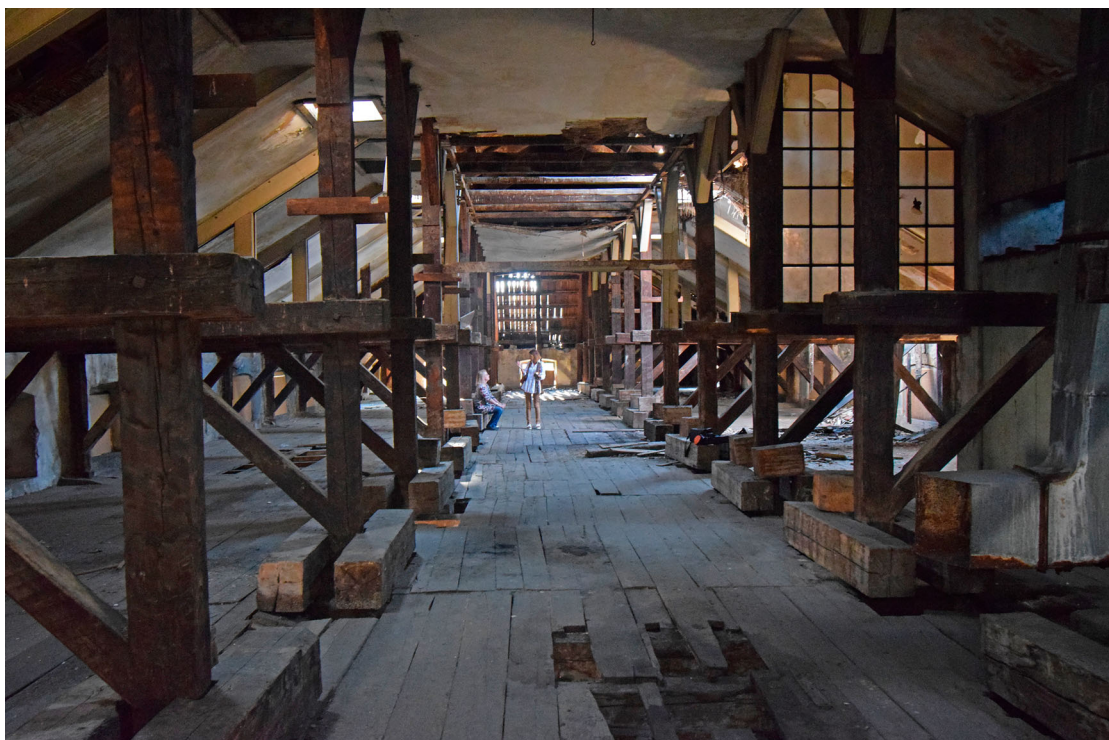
Tobacco Factory T-building, existing condition of the roof structure, transverse section (Marko Franković, 2018).
